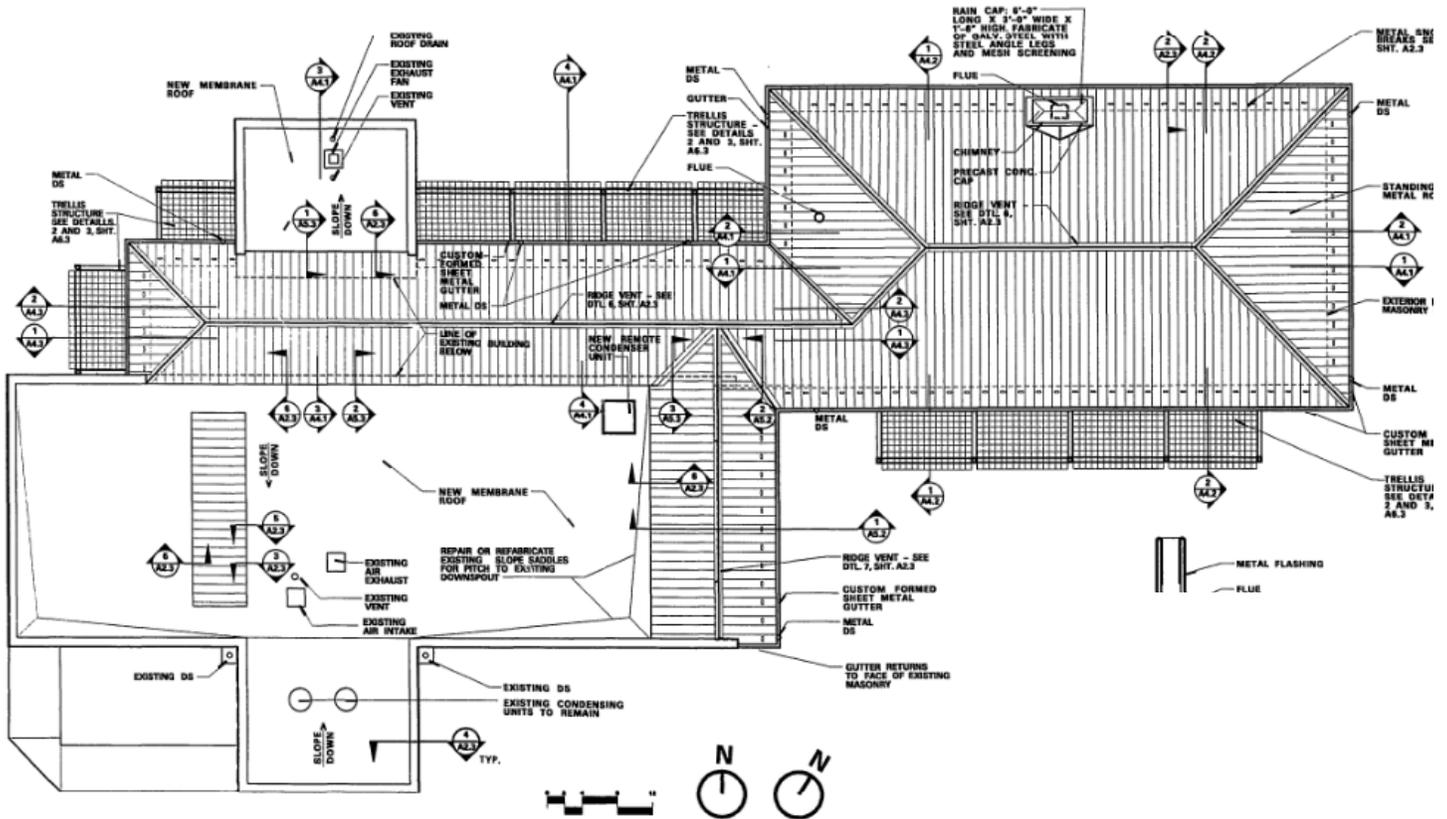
Existing Addition Drawings - Extent of Roof Replacement.
